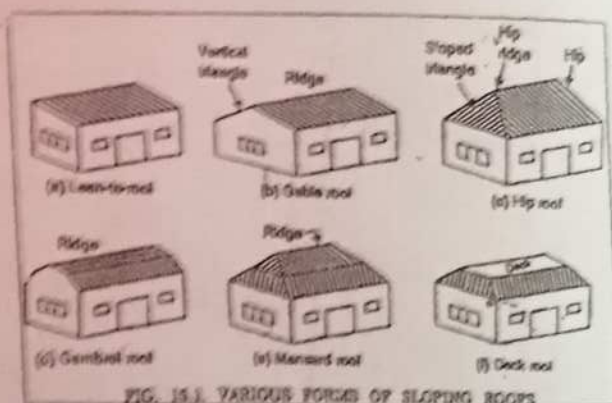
VARIOUS FORMS OF SLOPING ROOFS
